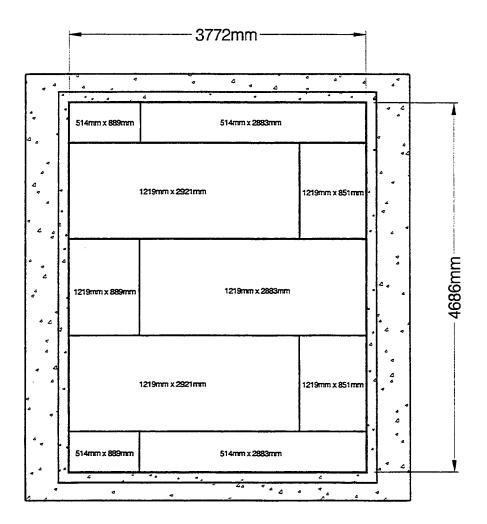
Single layer or base layer gypsum board layout, resilient metal channels 406 mm o.c.
